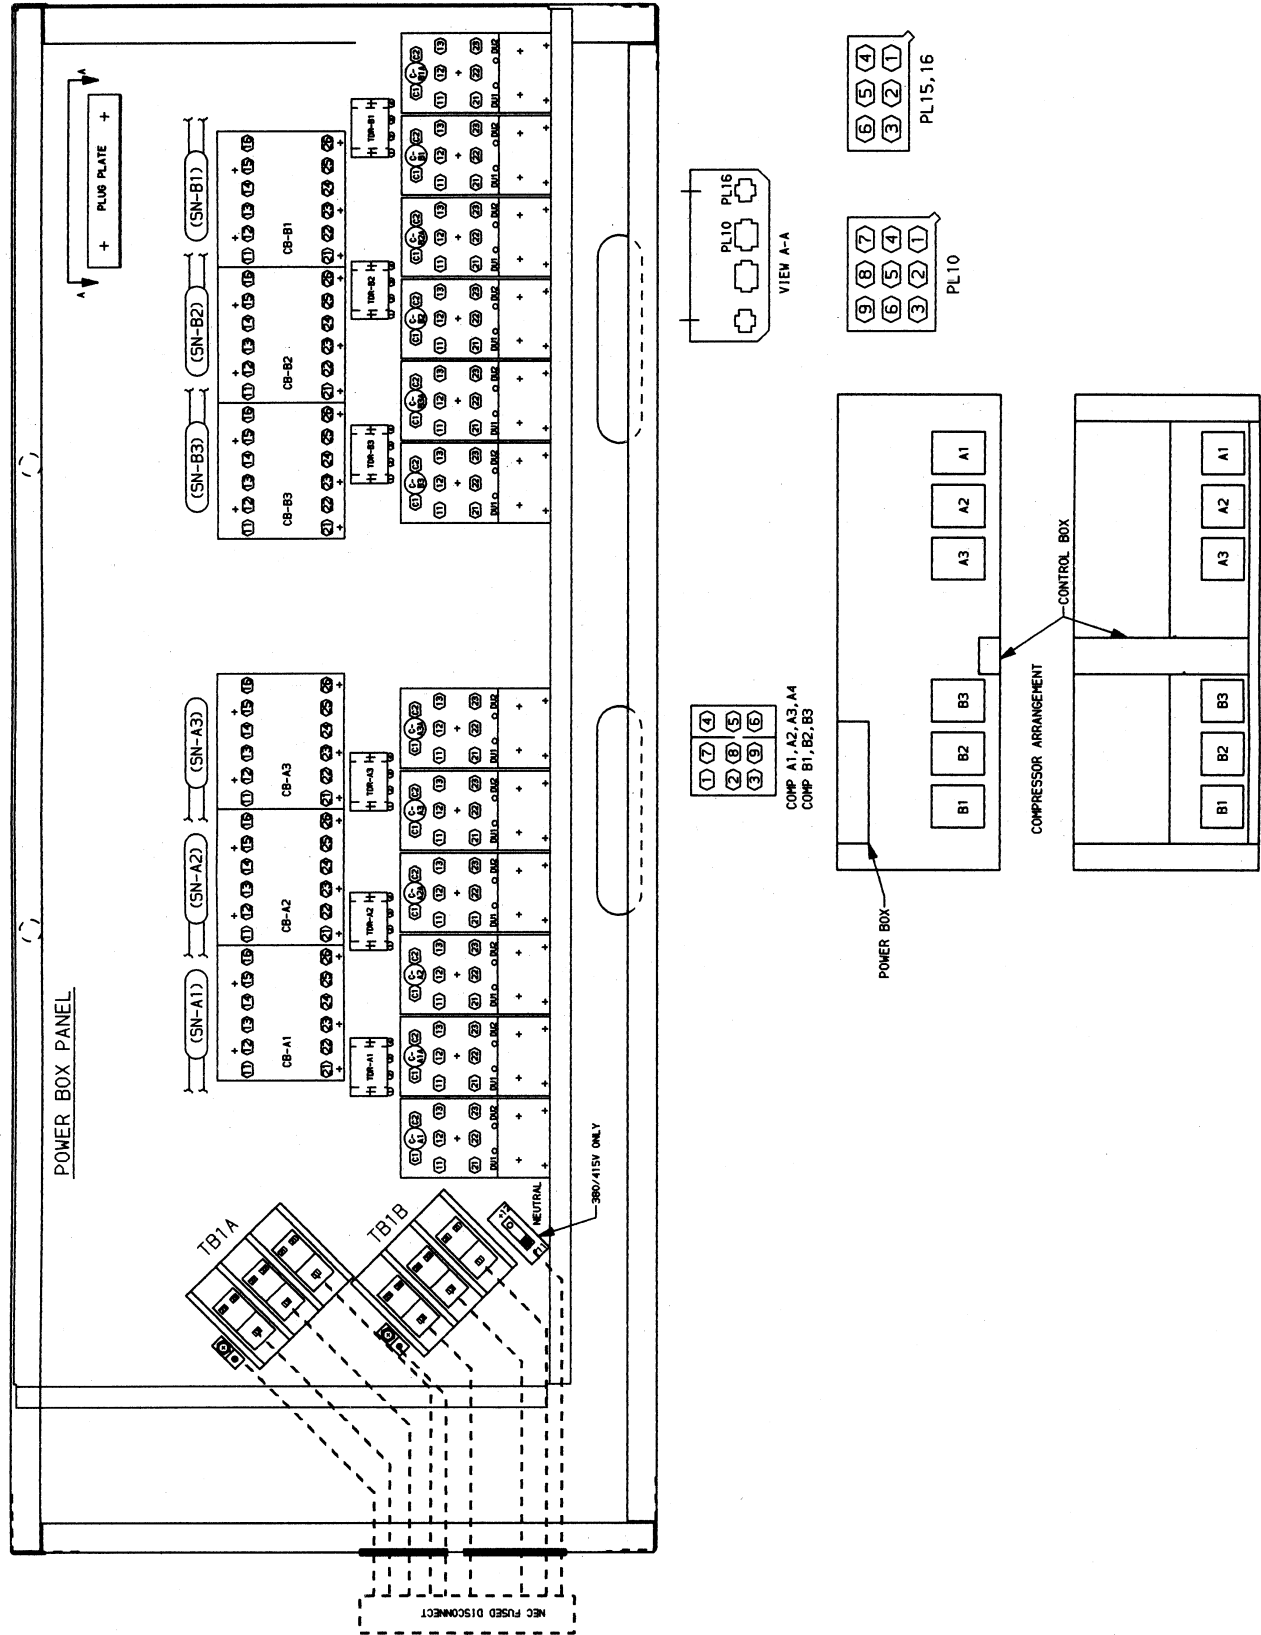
Power Box Location and Component Arrangement; 30GTR, GTR, GUN, GUR170, 190, 270A, 290A, 330A/B, 360A/B, 390B; 380, 380/415, 460, 575 V - PW
